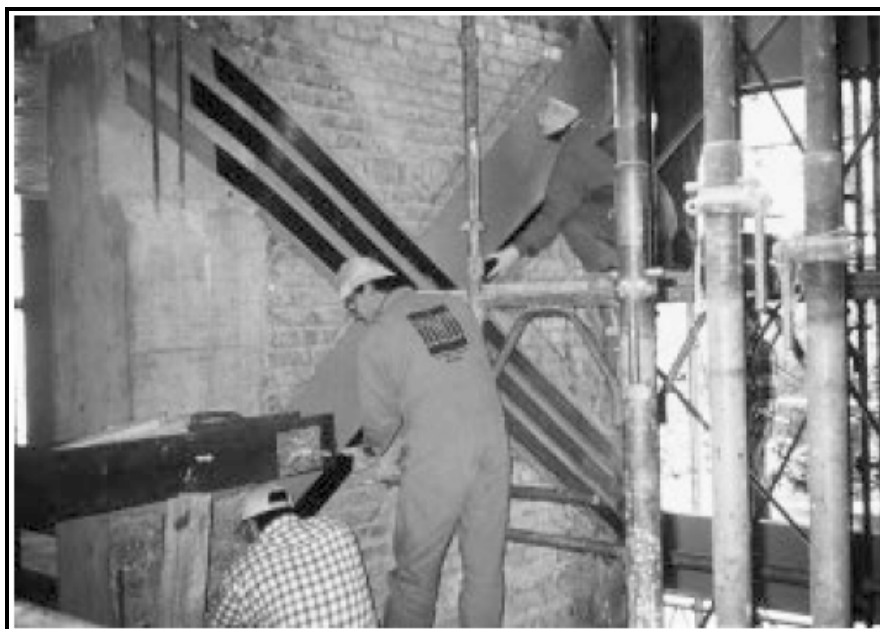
Application of the CarboDur plates to the masonry wall.
